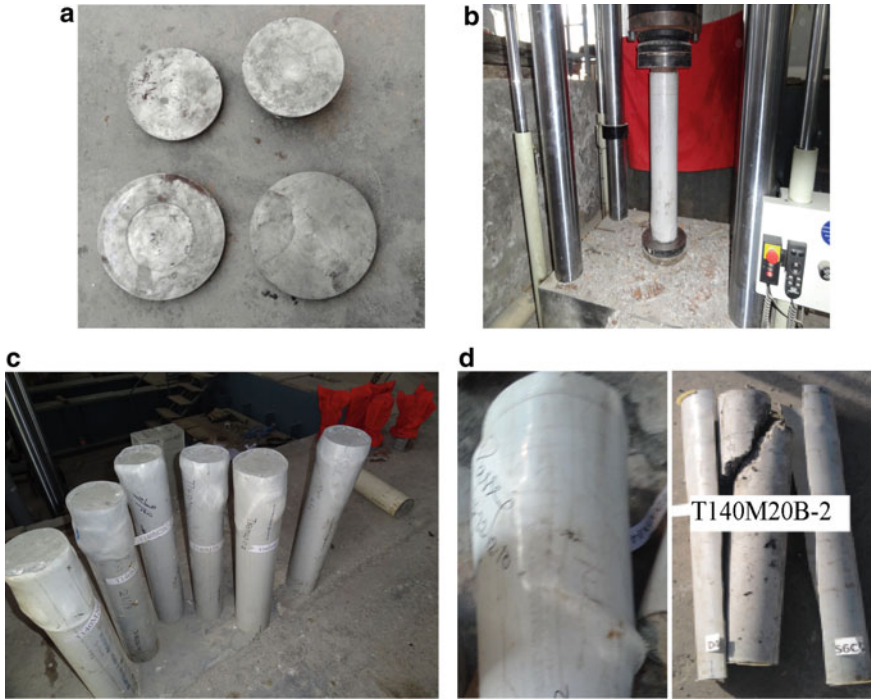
a Steel plates for loading only the concrete core in a CFUT. b UPVC pipe columns during testing (only concrete loaded). c Typical mode of collapse UPVC pipe columns. d Visible shear crack in mode of deformation
